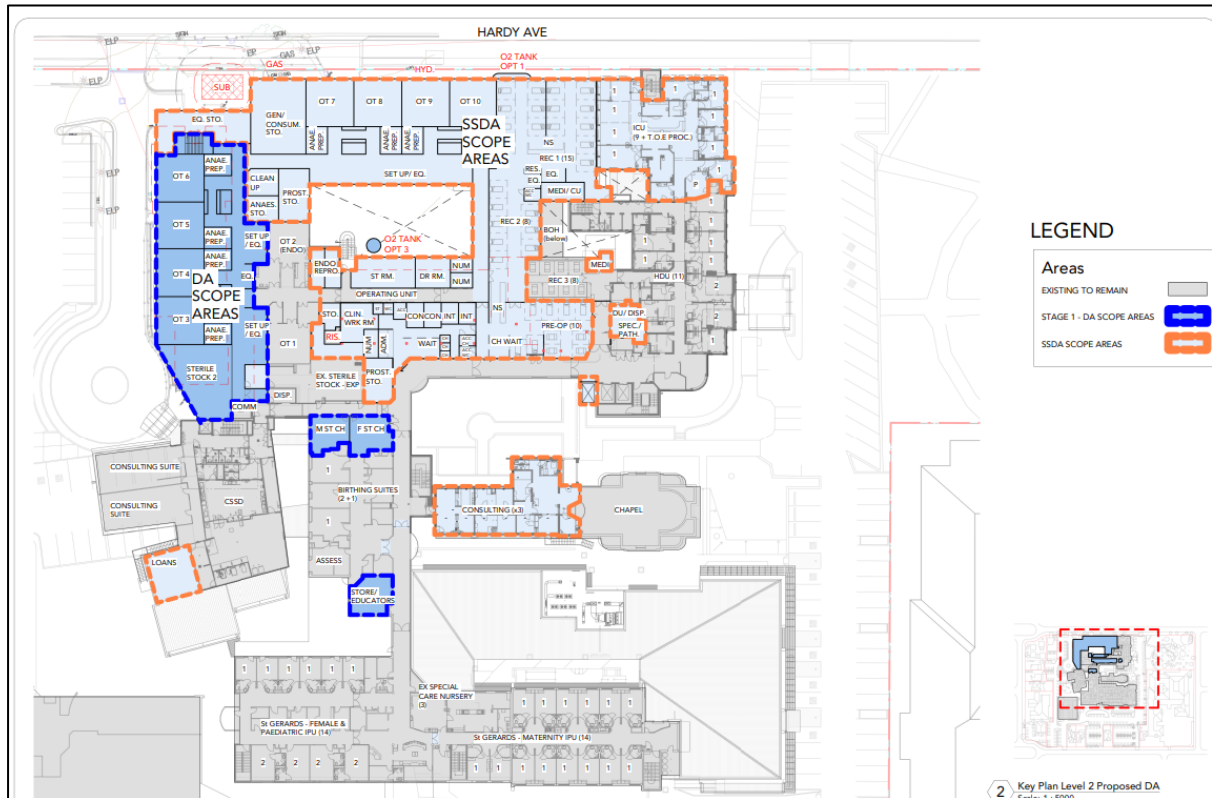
Calvary Riverina Master Plan Level 2 (Source: Team2 Architects, 2026)
